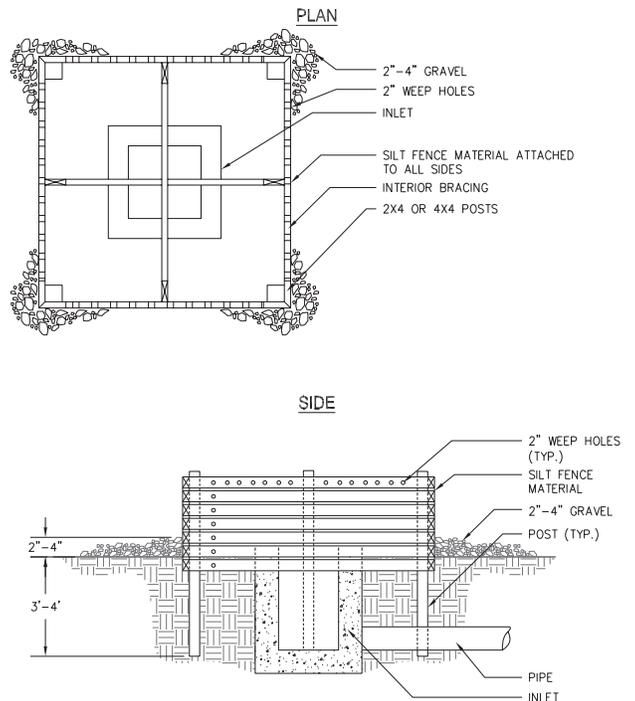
Baffle Box Installation Requirements (Sd2-B)
